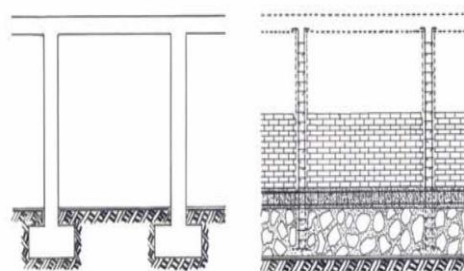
Confined Masonry (right) And RC Frame Construction (left)
